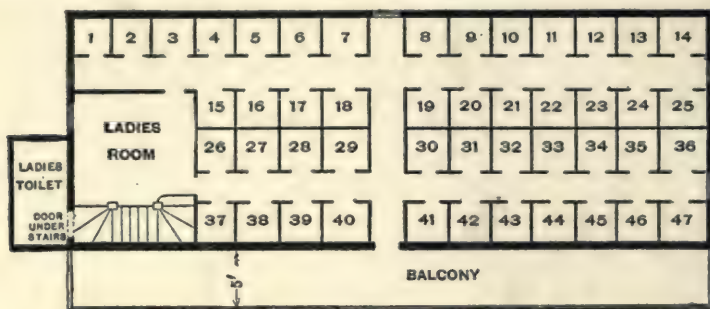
Main Floor Plan of a Bathing Pavilion.
